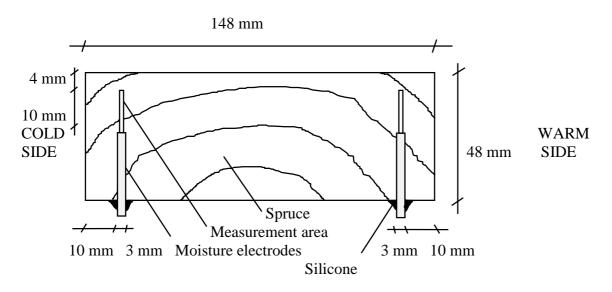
Detail of top plate in a timber frame wall section showing location of two pairs of moisture electrodes.
